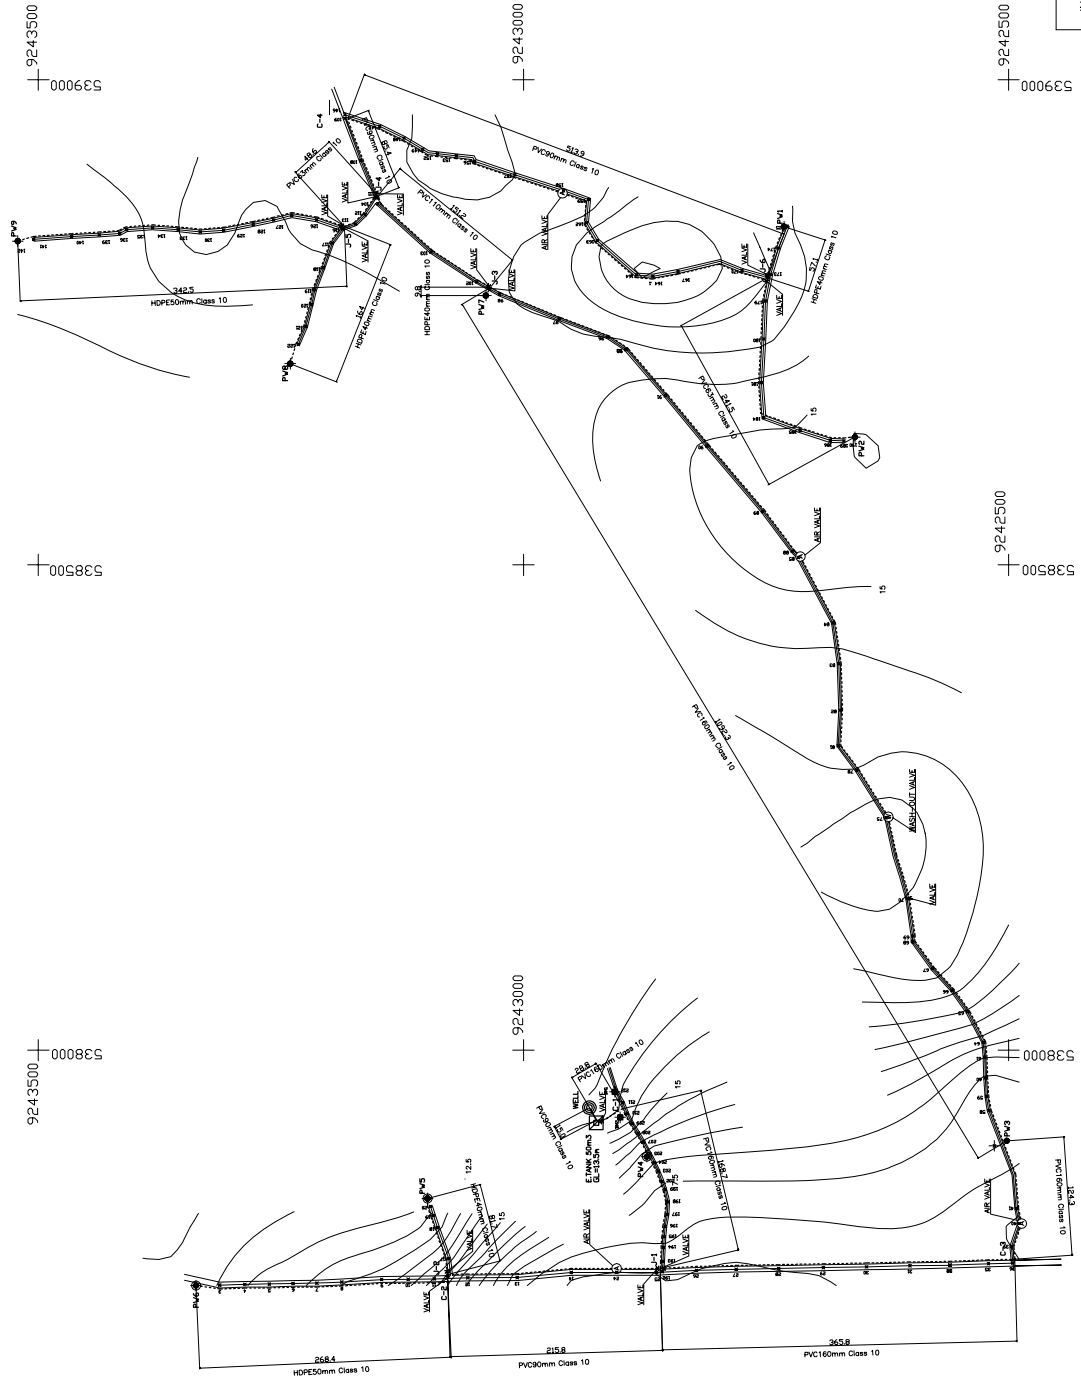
Layout Plan of Water Supply Facility (Kibugumo)
